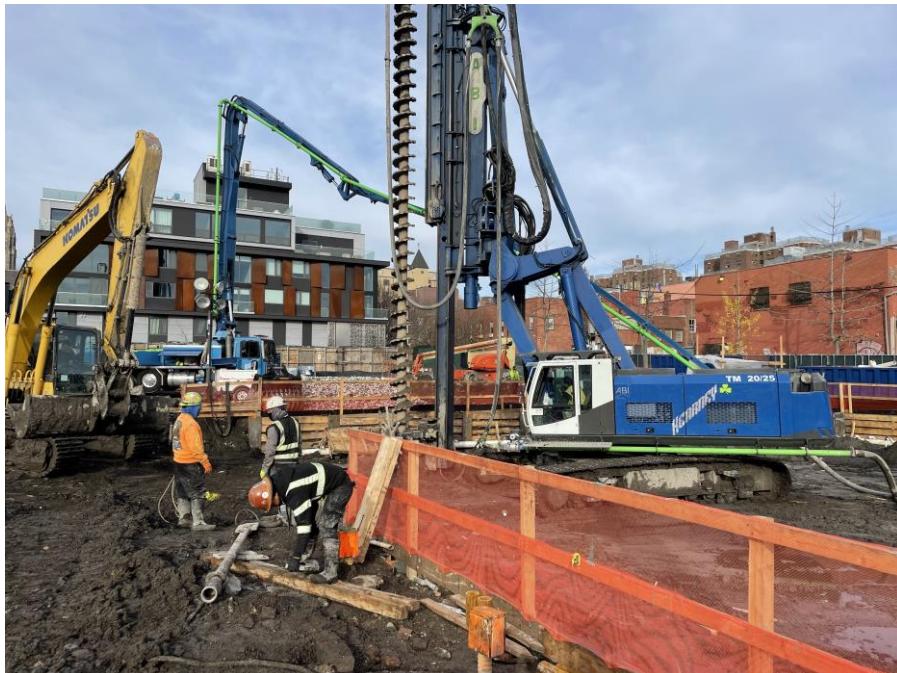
Kingdom installing foundation piles in the northern part of Society Brooklyn (facing north)
